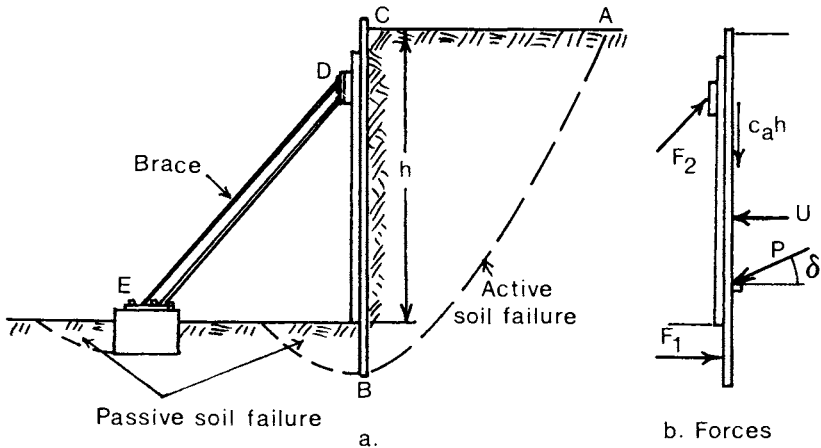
Forces acting on a braced sheet metal retaining wall.
